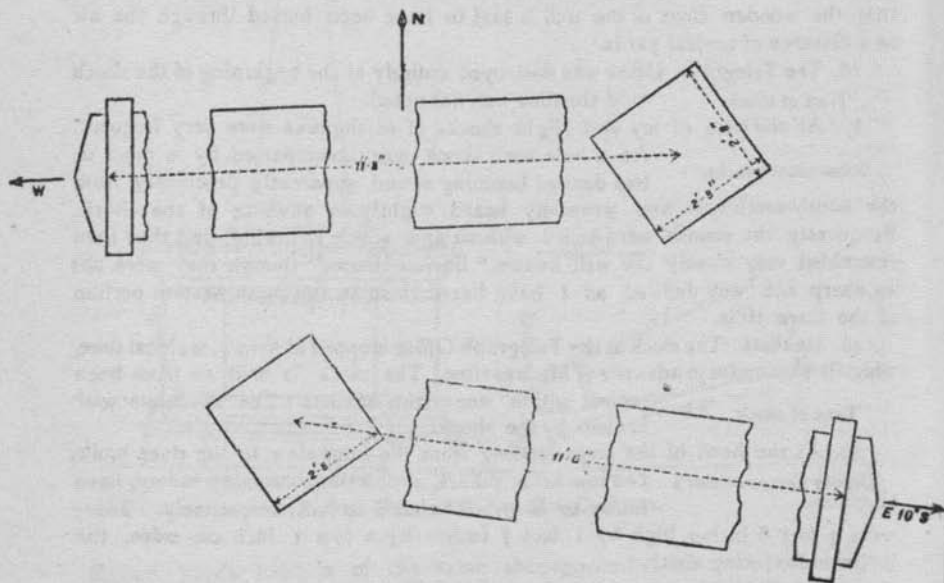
Plan of overthrown gate pillars at Gauhati.
